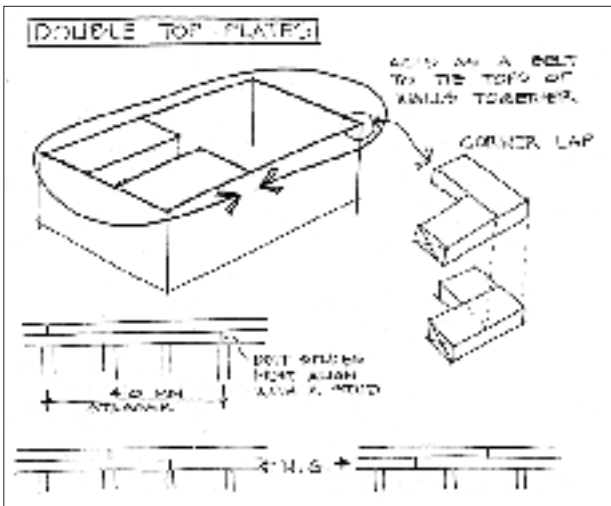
Staggered joints (4'-0" min.) and lapped corners are needed to tie walls together and to create a strong double-top.
